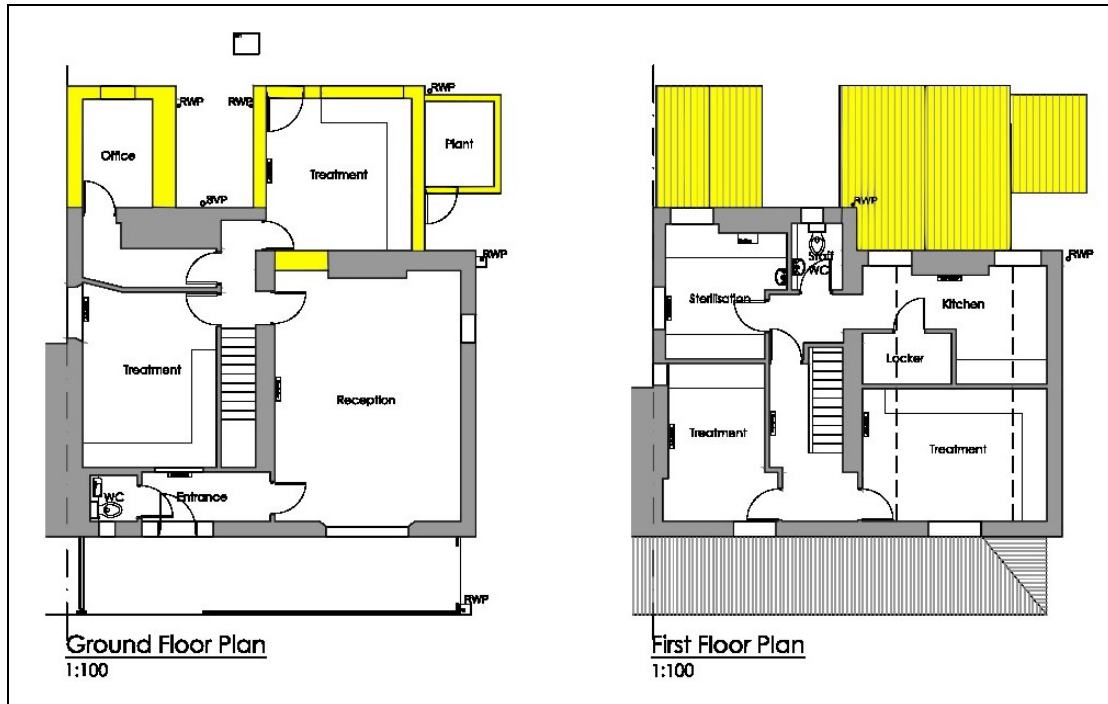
The proposed removals of fabric to the existing structure at Six Gables marked in yellow on the current plan of the building.
